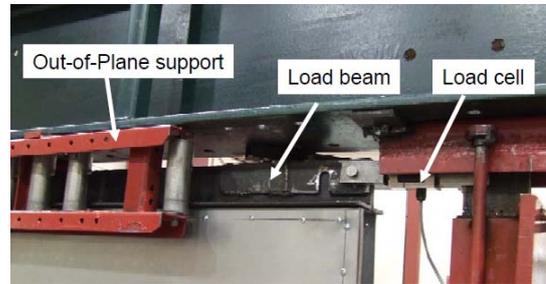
A view of installed roller to prevent outward movement of the wall plate[8].
